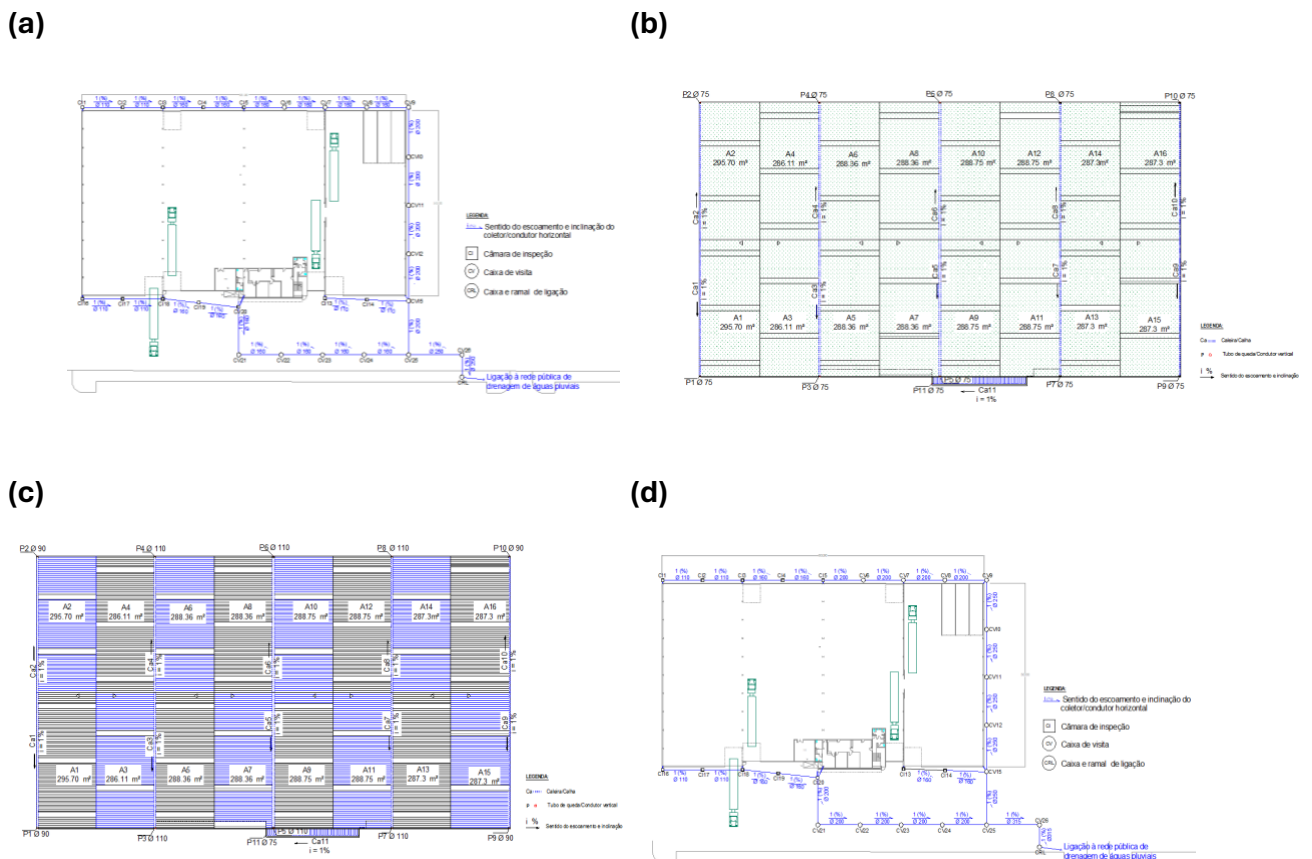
Rainwater drainage network: extract of the roof plan (a) and first floor (b), conventional roof; extract of the roof plan (c) and first floor (d), green roof.
